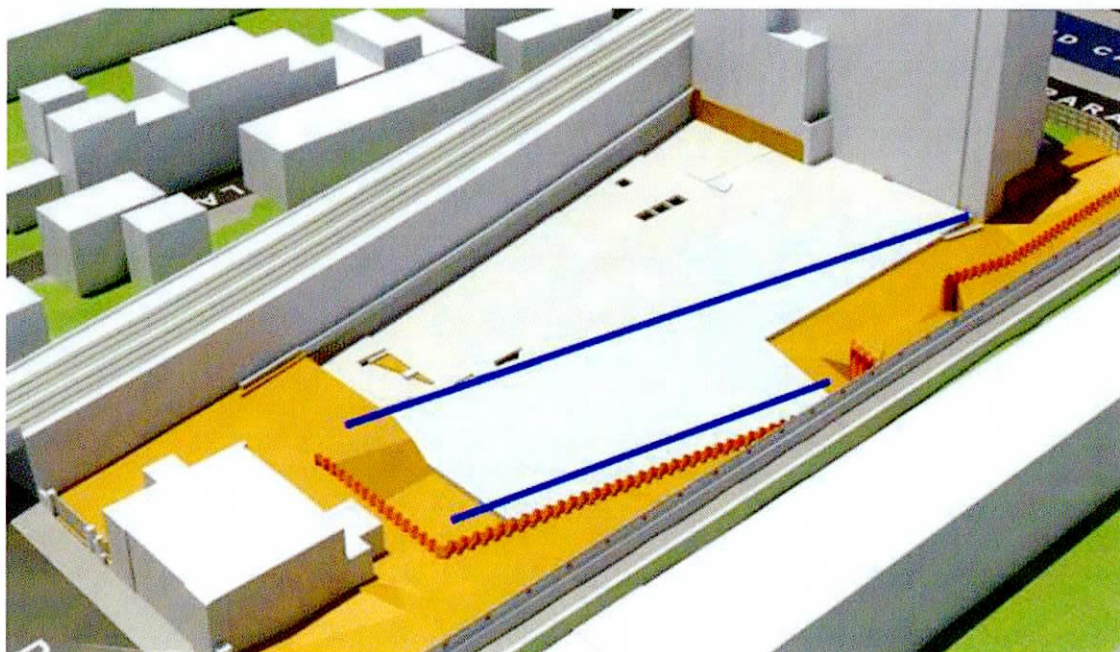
Proposed Station Box (Drawing No.162123-8104)
